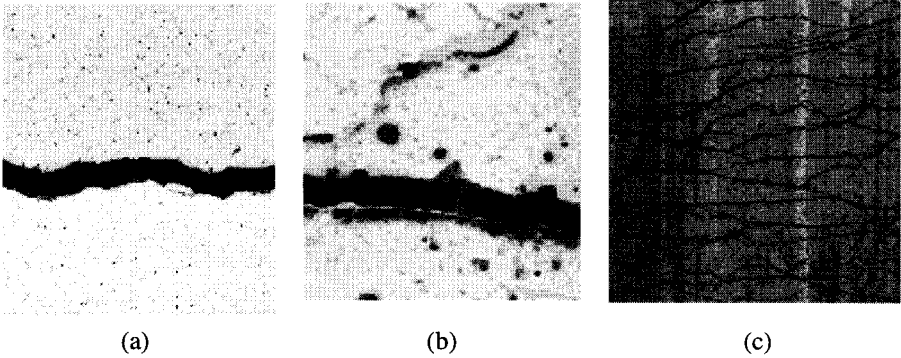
Computer Scanned Images of (a) Plain Cement Showing Brittle Failure, (b) FRC Showing Single Crack Opening and (c) ECC Showing Multiple Cracking [3].
